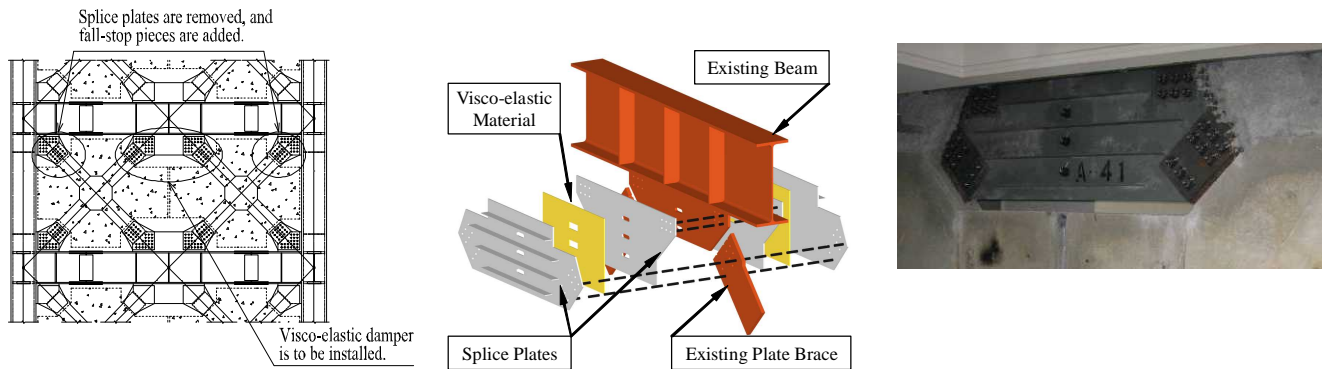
Overview of installation of viscoelastic damper at the joint between brace and beam on standard floor
